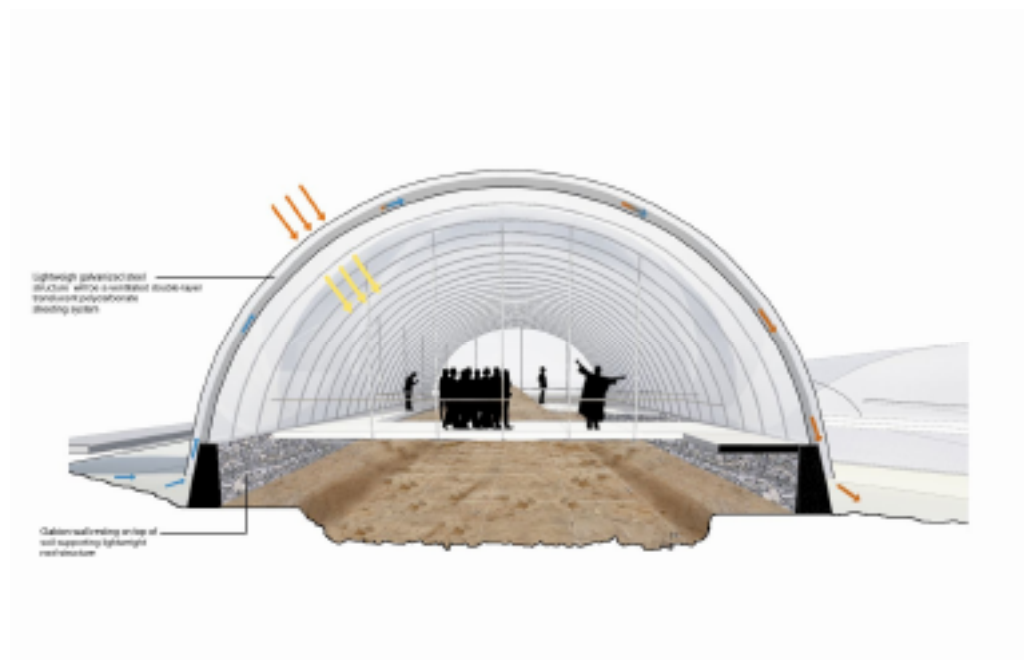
Fossil Dig Site Representation of the proposed extended roof structure: (Noero Architects 2013).
